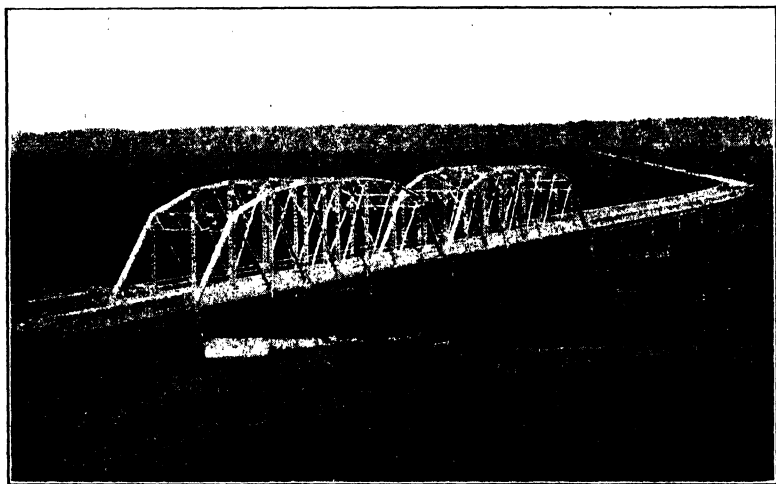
A pleasing structure. Through steel trusses with concrete deck-girder approach. Note area of waterway for an apparently small stream.
